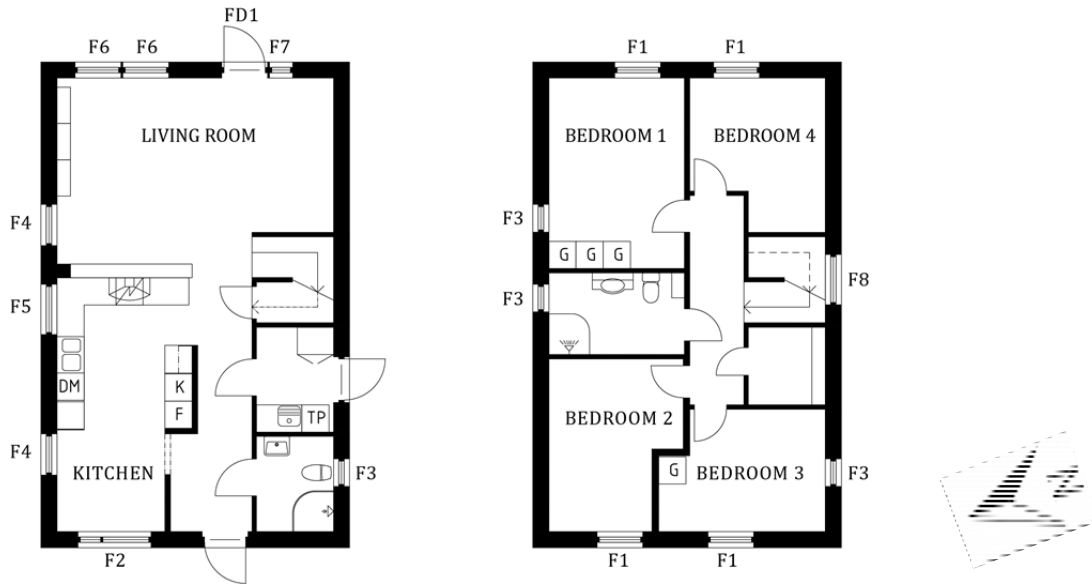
Villa Vänern floor plans (PEAB, 2012).
